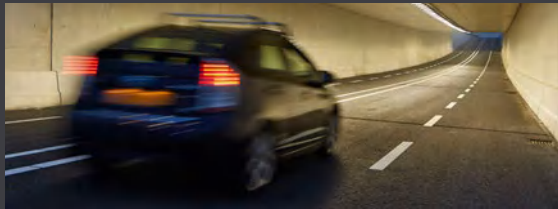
Contrast between road surface and walls in a tunnel.
